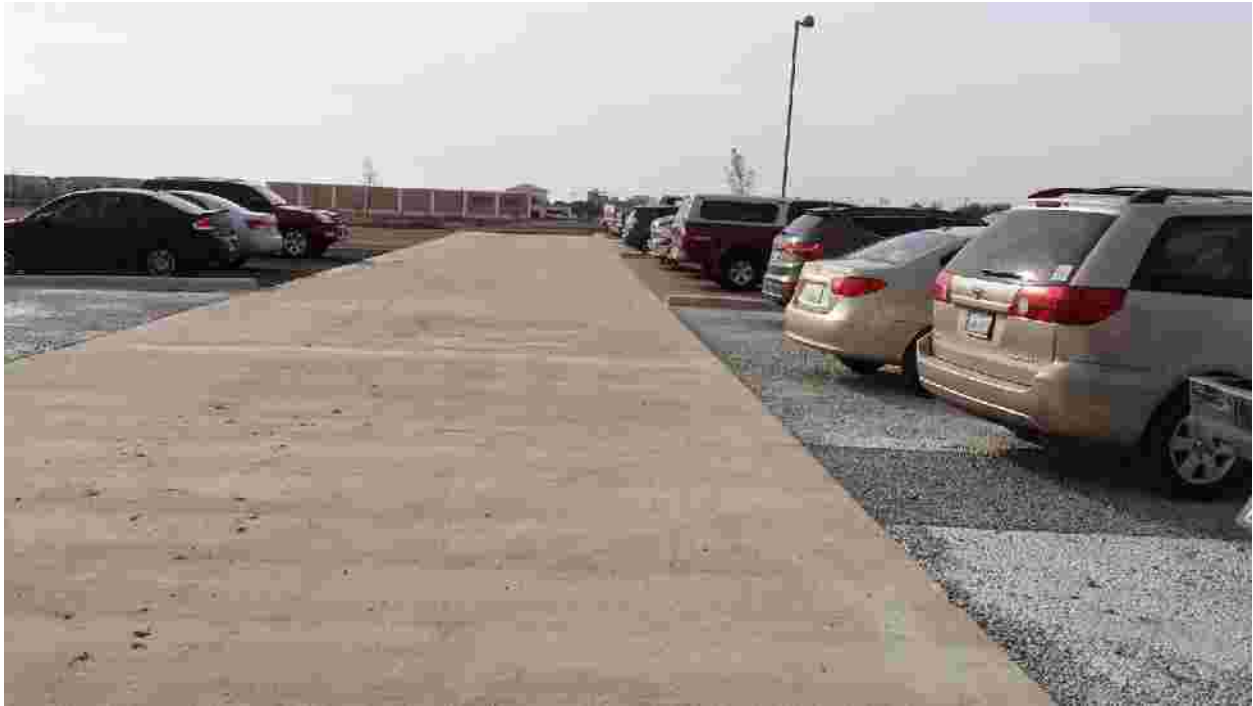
Constructed parking with all five types of permeable pavement hydraulically separated by a concrete wall.
